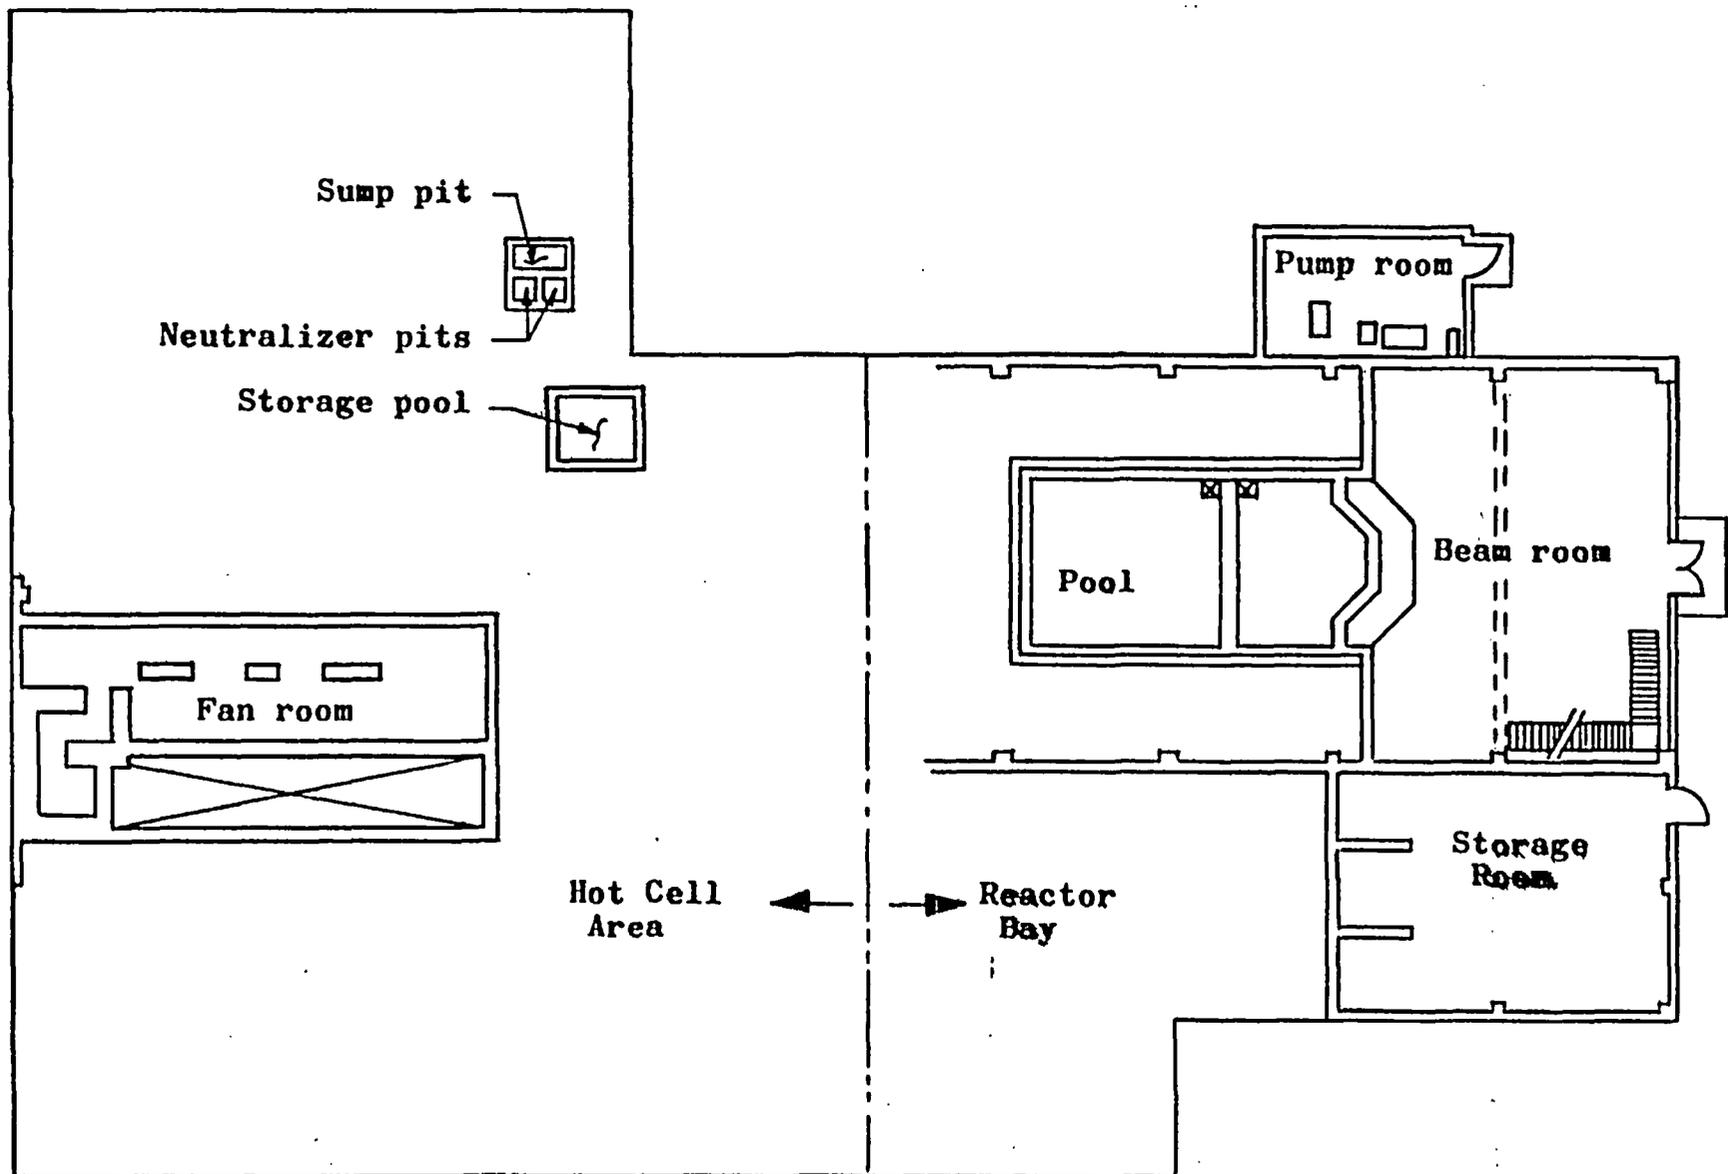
Basement Floor Plan of the Quehanna Nuclear Pilot Plant
